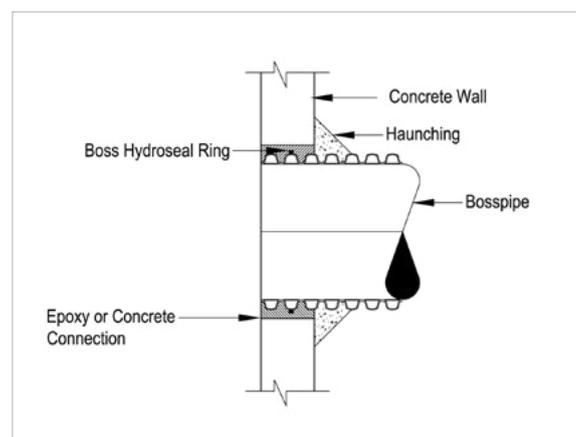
Manhole Connection with a Boss Hydroseal ring
